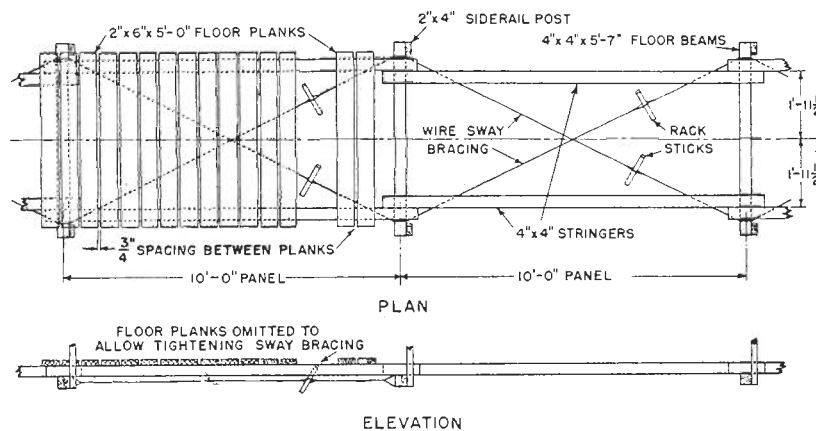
Wire sway bracing of suspension footbridge. Sway bracing increases stability and minimizes side sway.
